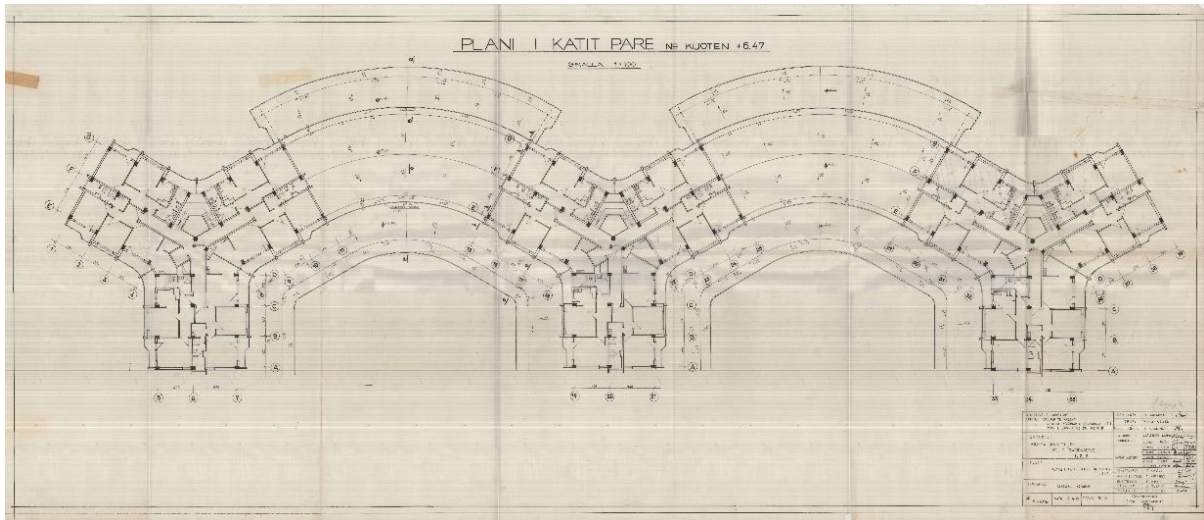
Ground floor plan of “9 Katëshet” Residential Complex (AQTN).
